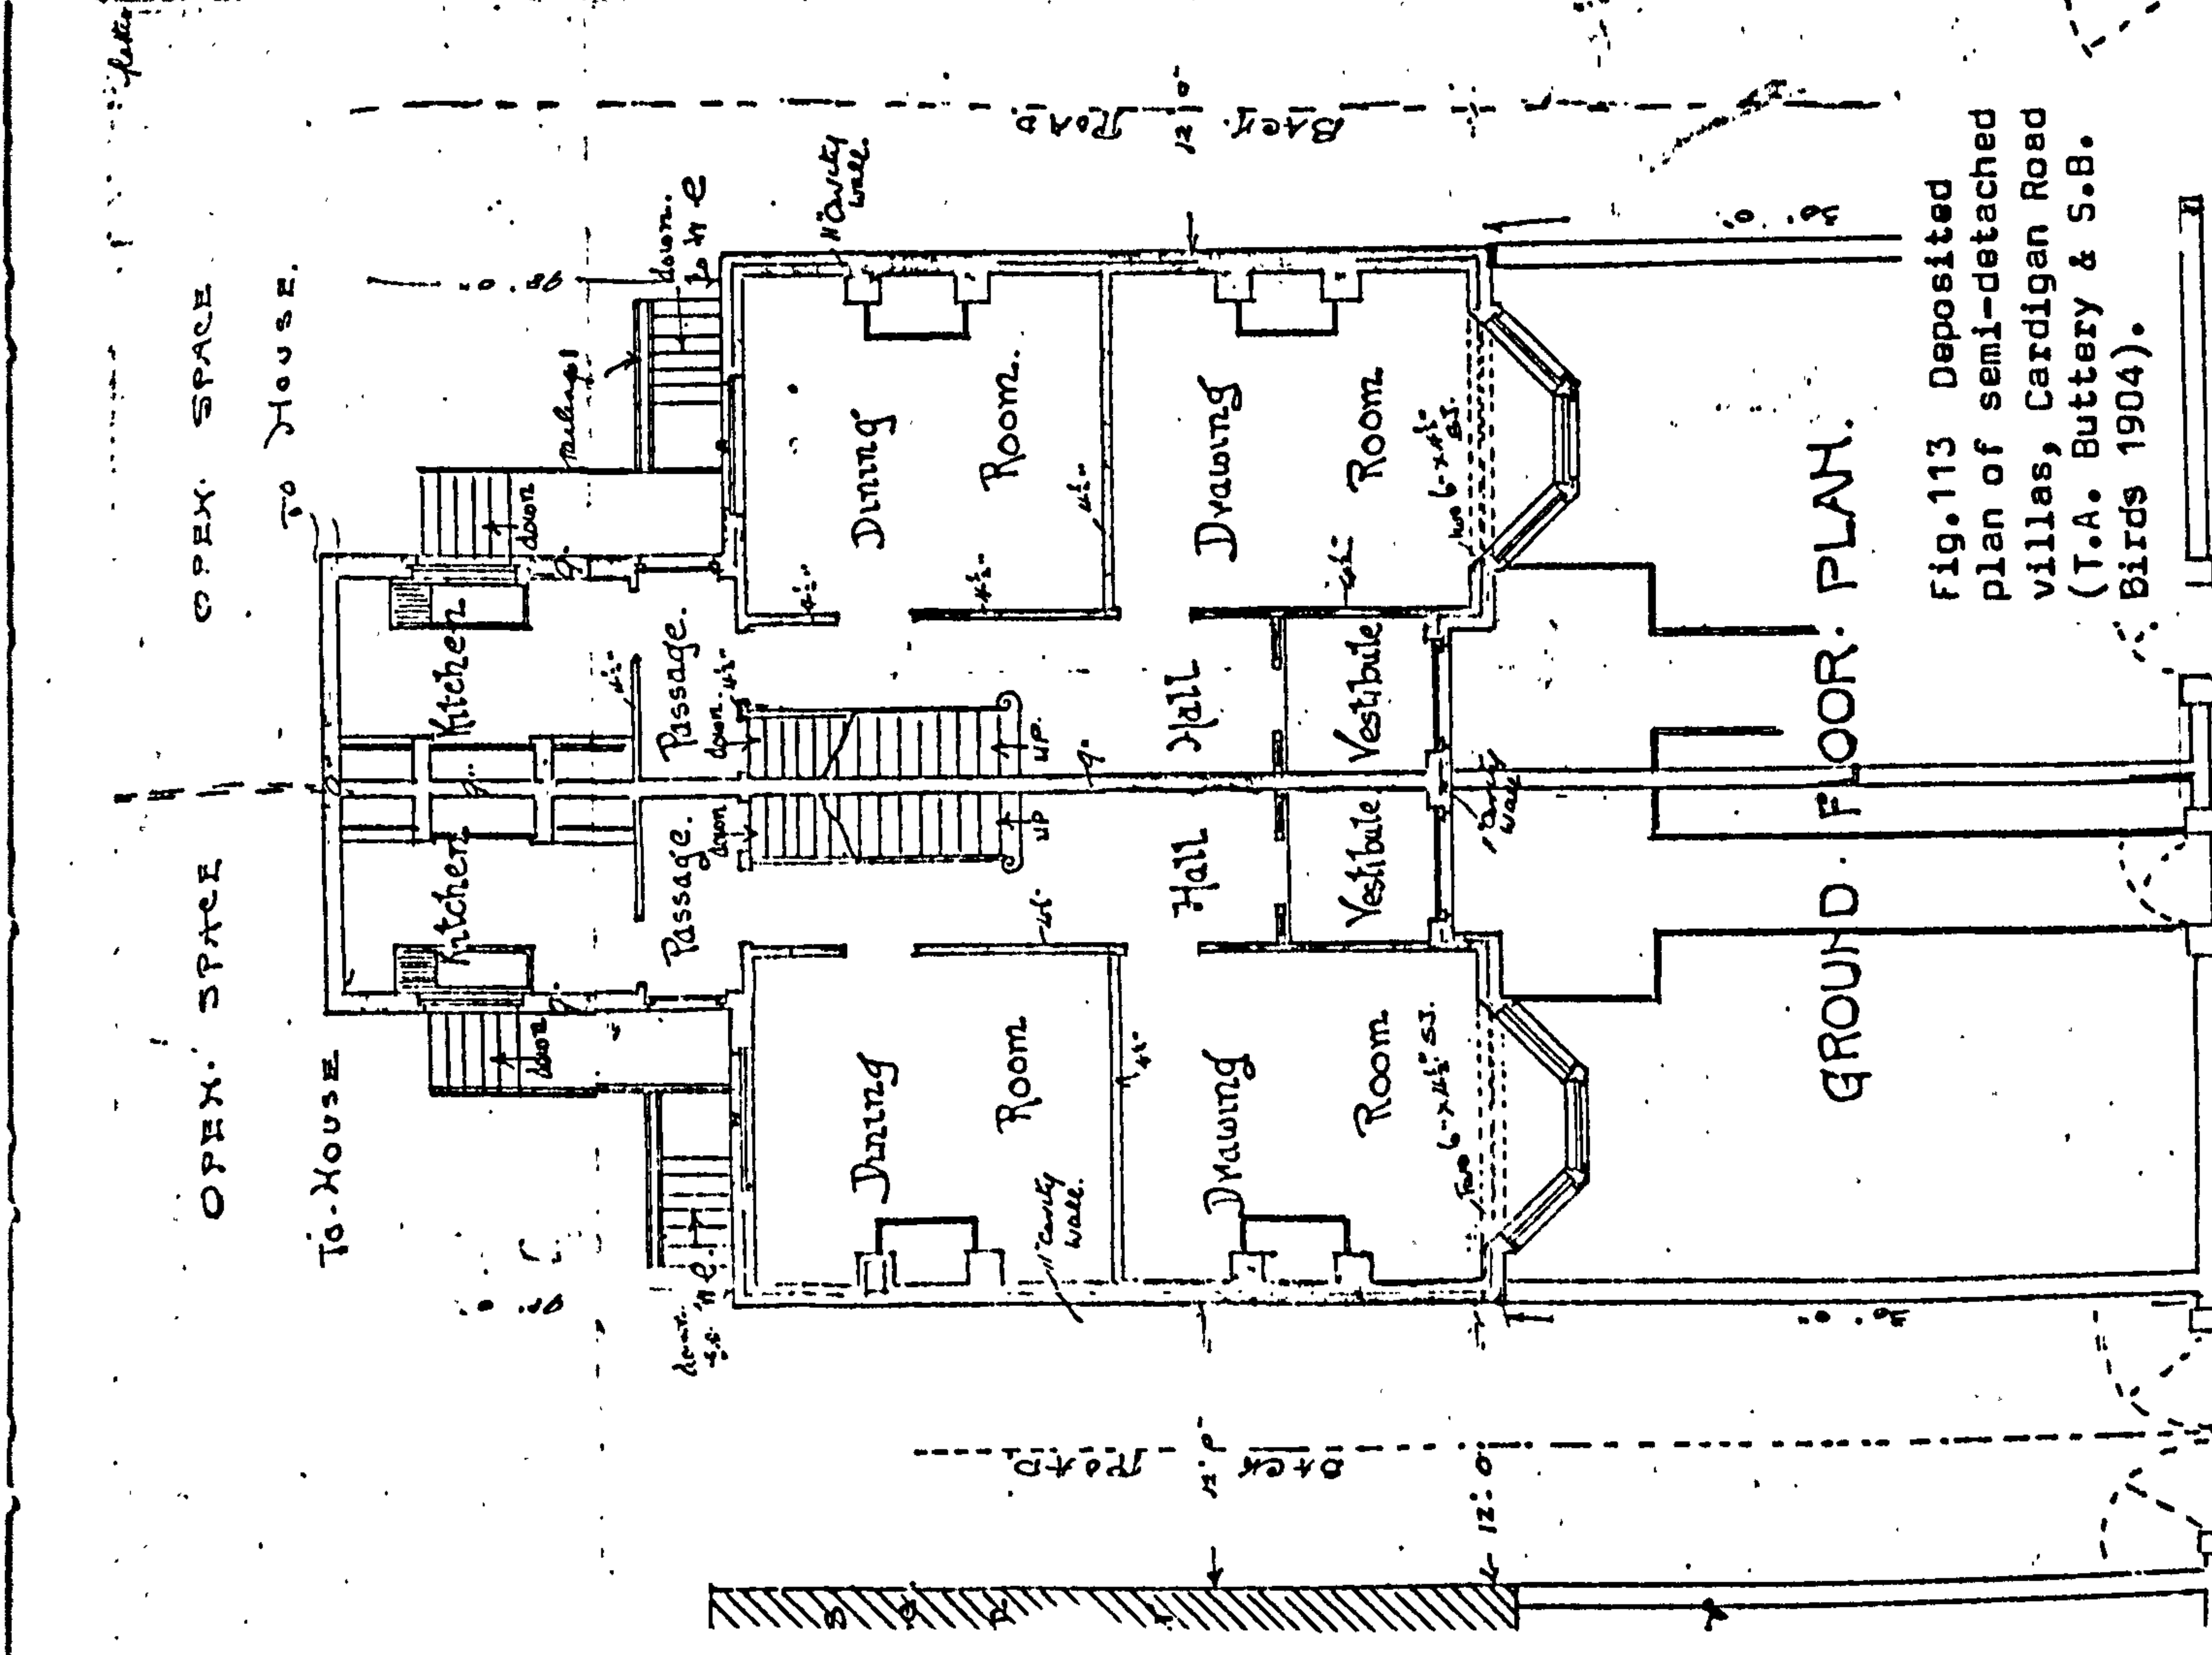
Deposited plan of semi-detached villas, Cardigan Road (T.A. Buttery & S.B. Birds 1904).
